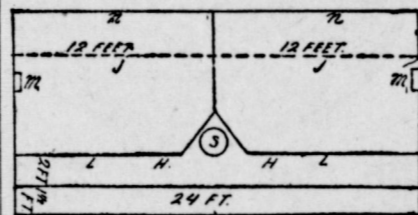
GROUND FLOOR OF POULTRY HOUSE.
